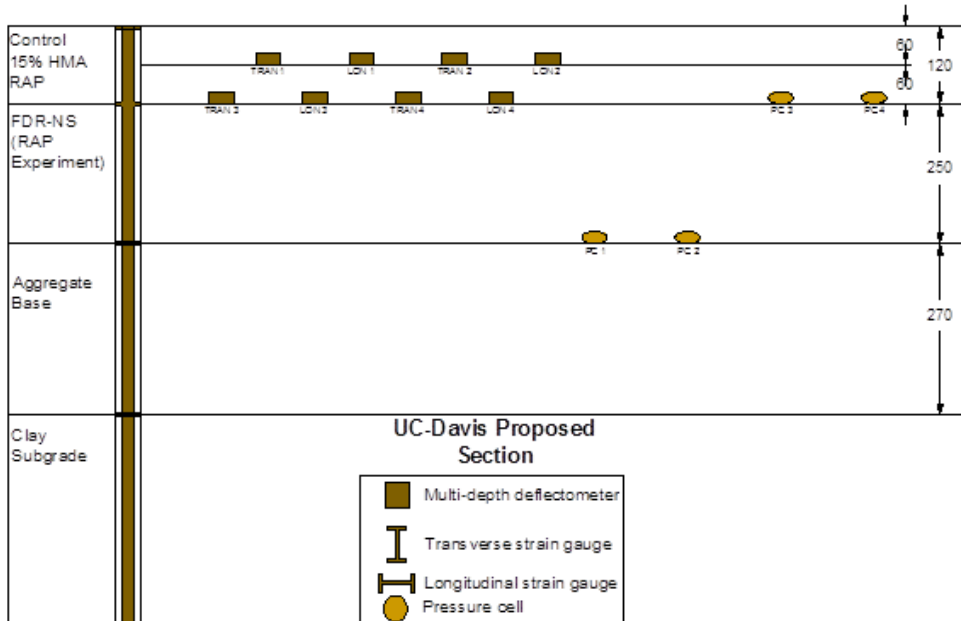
Illustration. Profile view of pavement structure and instrumentation for the 15%-RAP-AC test section at UC-Davis.
